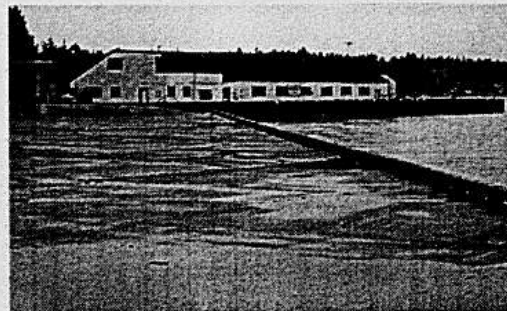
Reinforced bulkhead at North Shore Recreation Area
